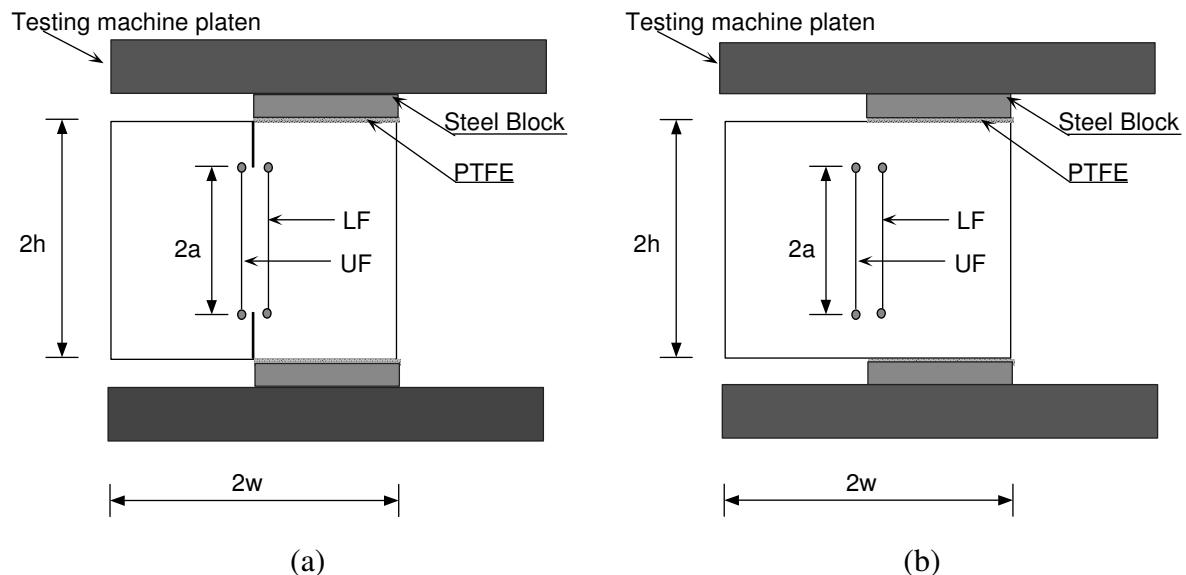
The testing arrangement, (a) the notched specimen; (b) the unnotched specimen.
